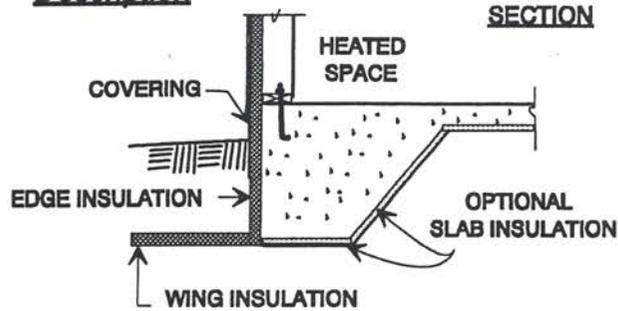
Typical construction detail used to reduce thermal bridging at foundation, in externally-insulated masonry walls ².
